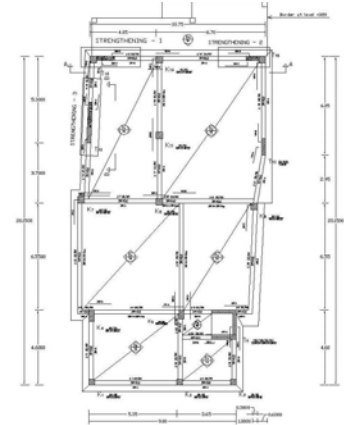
C: Plan View at the Elevation 10.50 m Showing Slabs, Beams, and Vertical Elements of the New (1980) Structure
